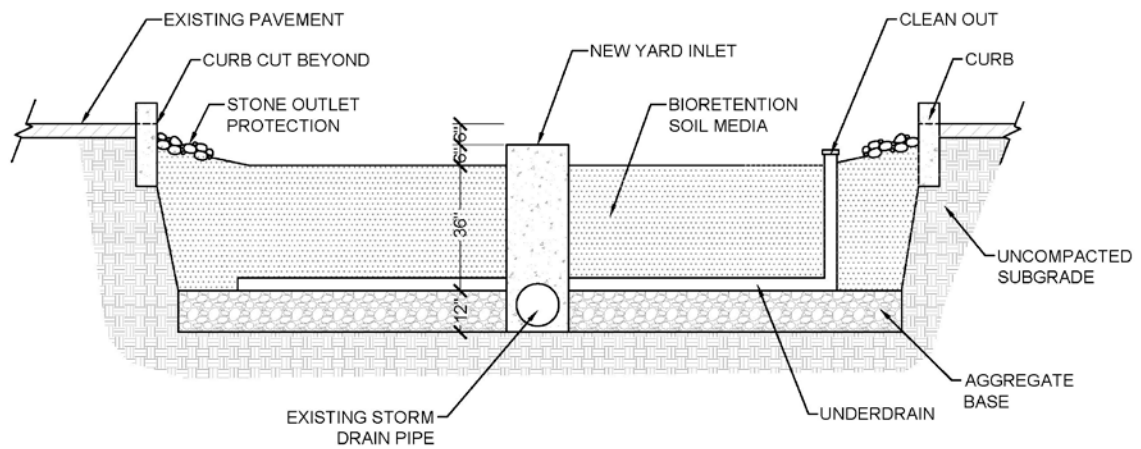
LID Pilot Project Site 2 Concept Plan
